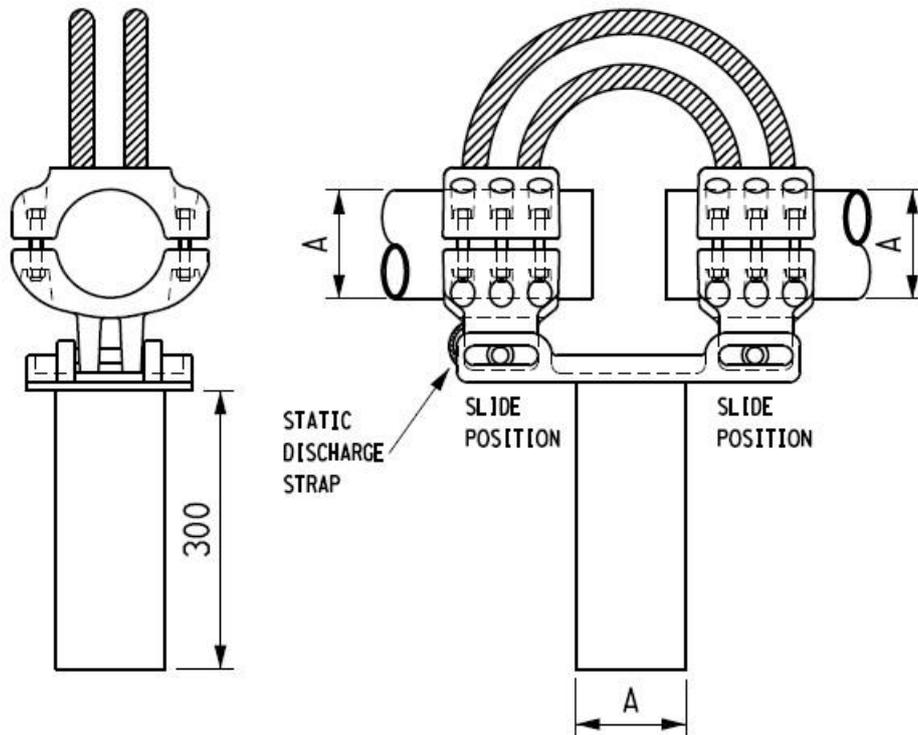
EEC-TB-SS: Expansion Clamp – Tube Mounted – Slide/Slide
